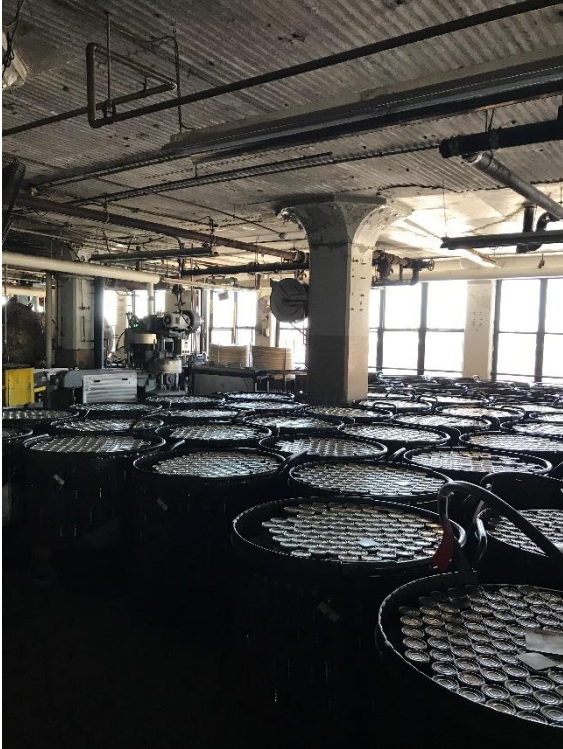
Main Factory Building. Reinforced concrete flat plate construction consisting of concrete columns with capitals supporting concrete slabs.
